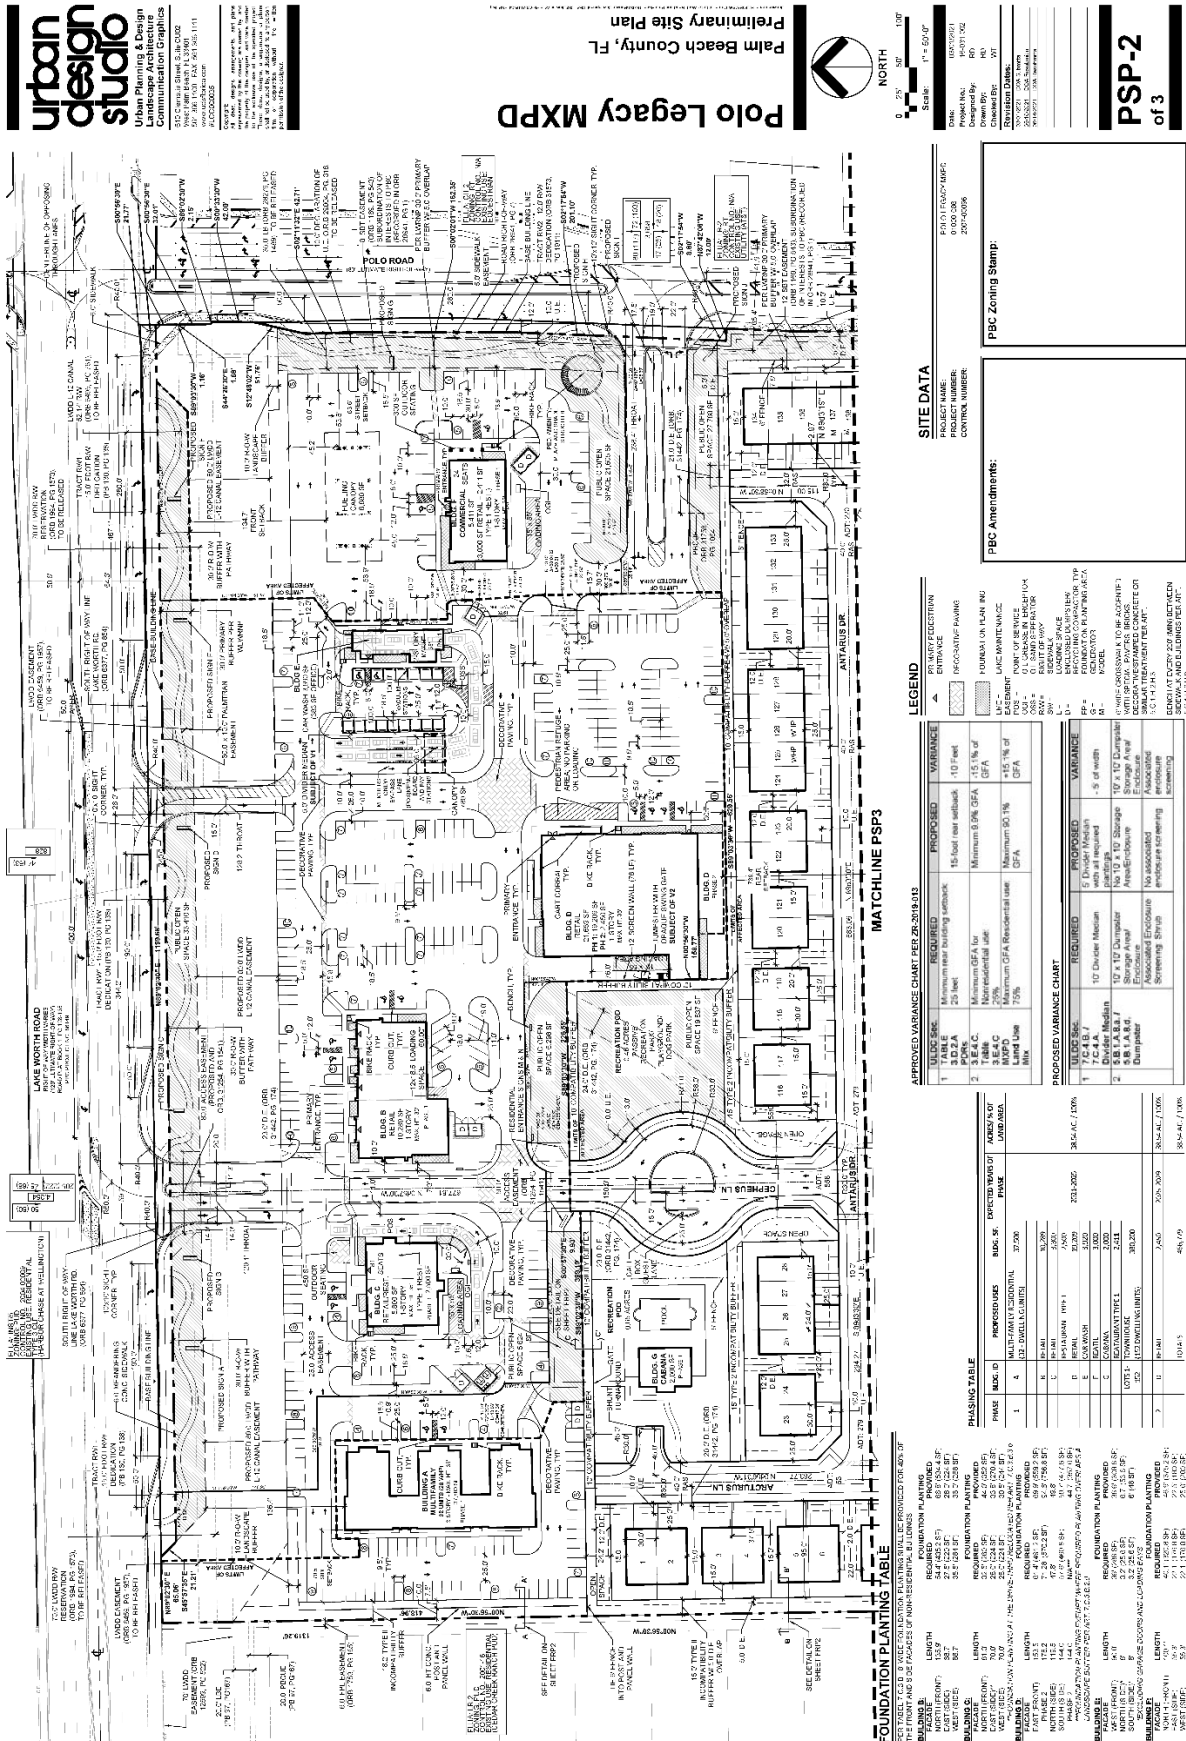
Preliminary Site Plan (PSP-2 of 3), dated June 14, 2021
